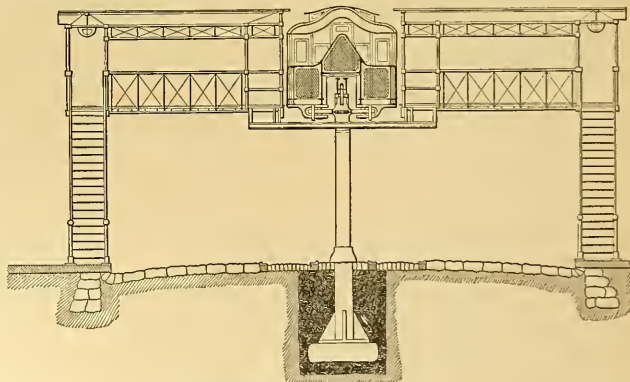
ADAMS' ELEVATED RAILWAY.
